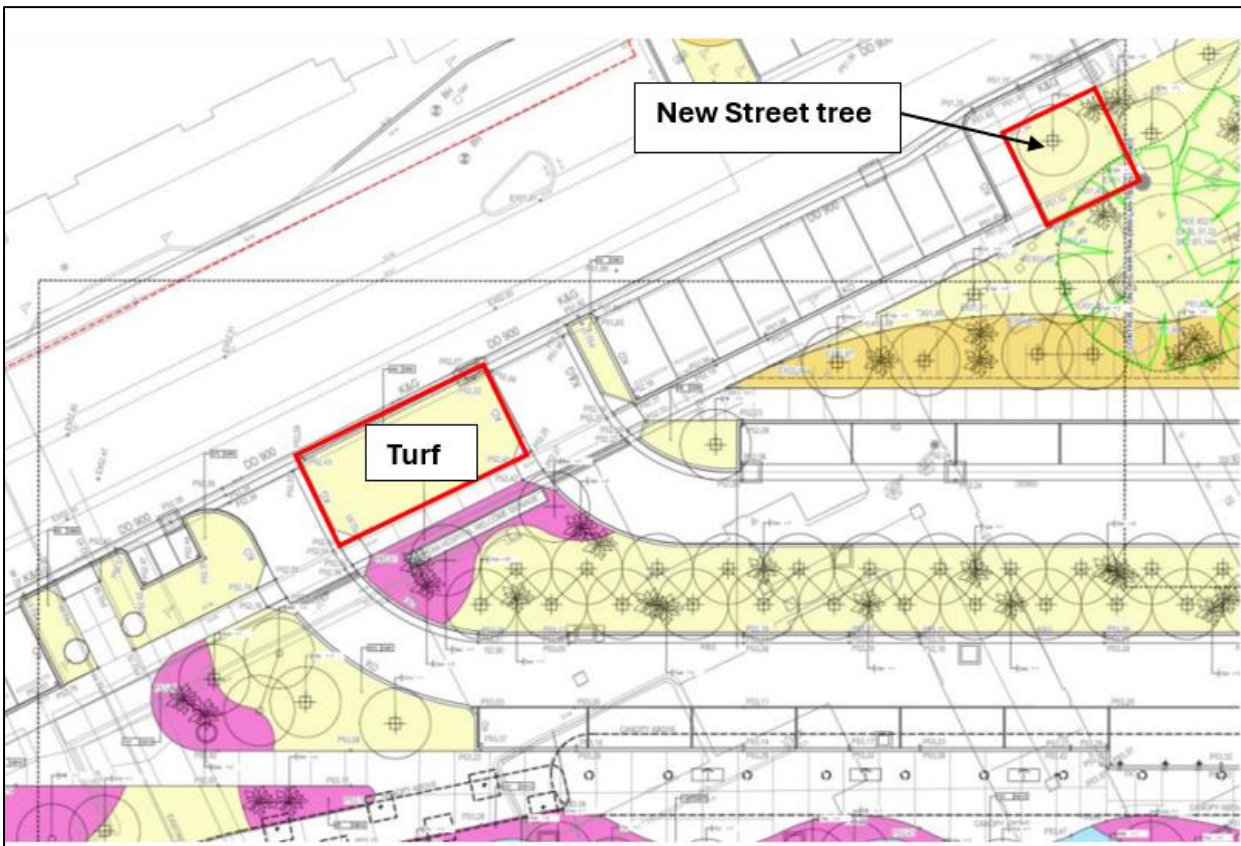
| Extract from the landscape plan identifying turf and street tree (Source: Tract)
